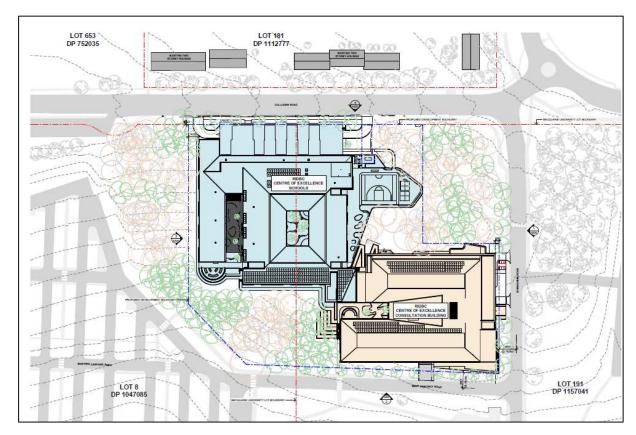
| Site Layout (Source: Applicant's supplementary information 2021)
